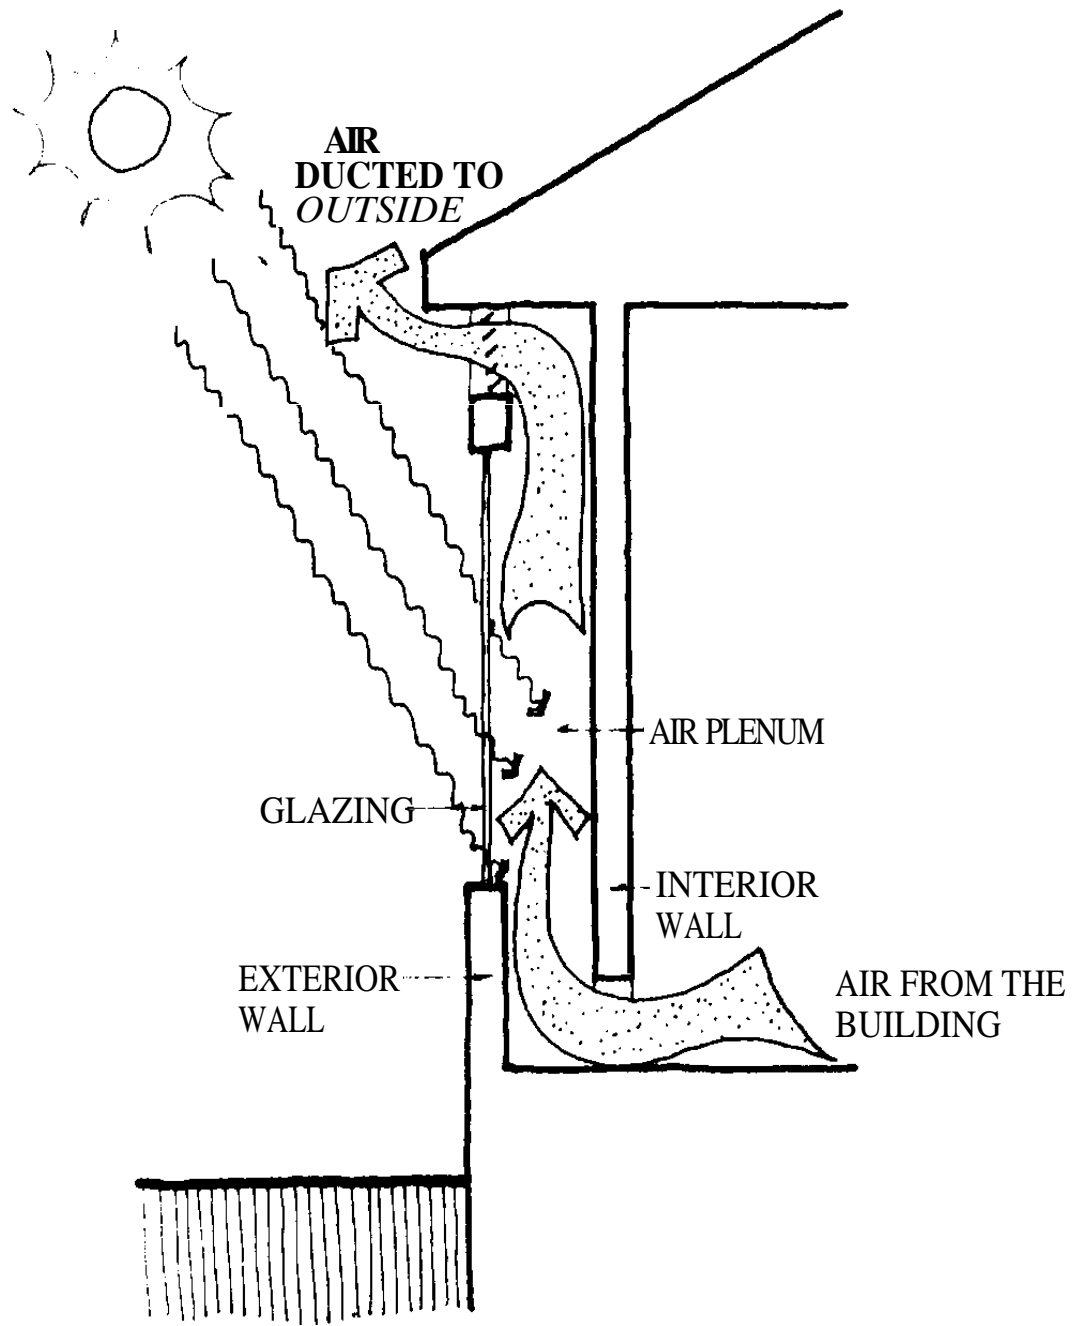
A wall design is a solar collector to induce ventilation through a building (CRO) (PUT).
